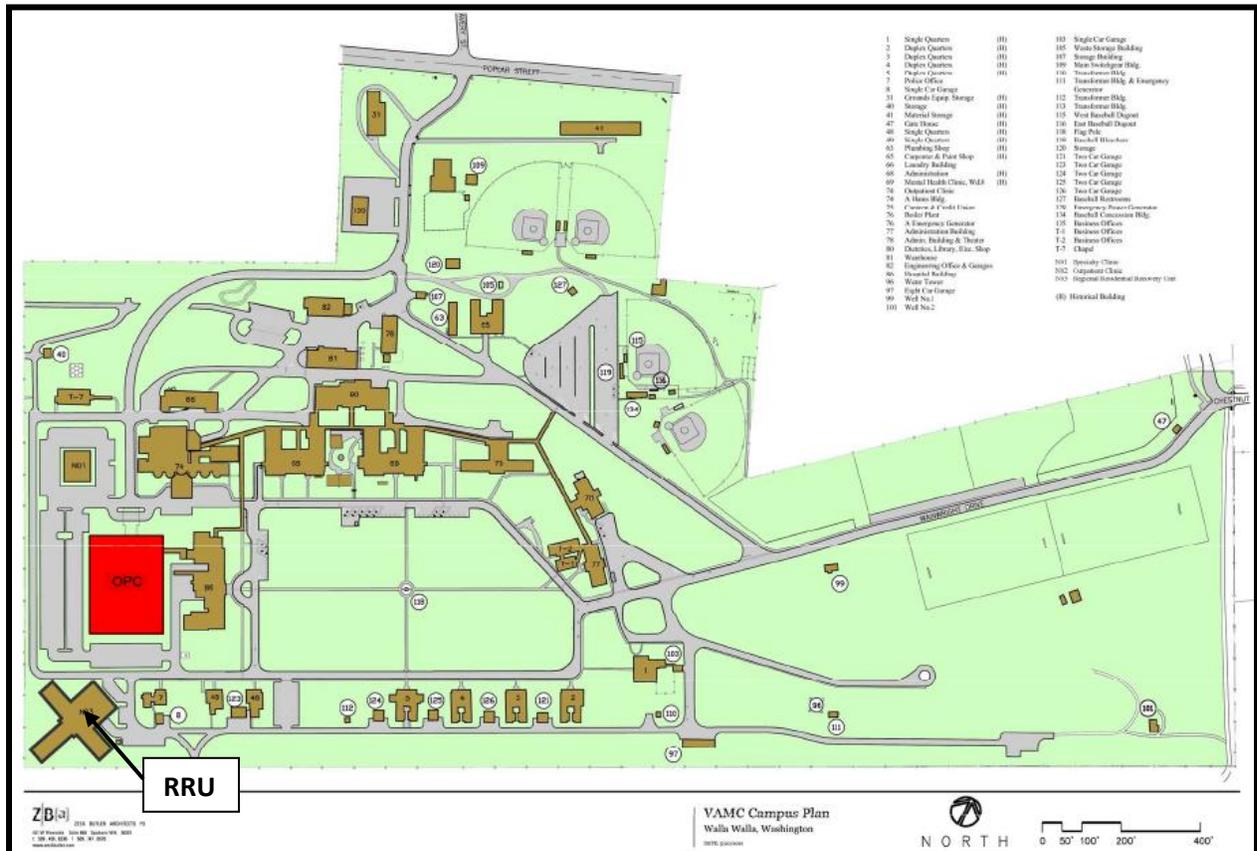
Map of VAMC Walla Walla campus showing location of OPC and RRU buildings.
